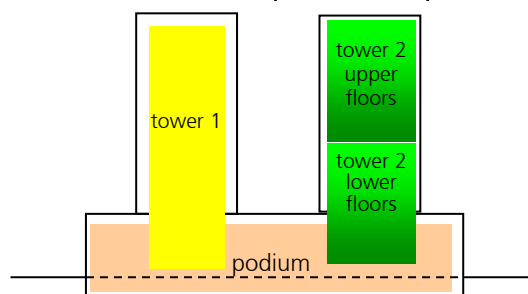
Two towers with common podium counted as 3 nos. building blocks
